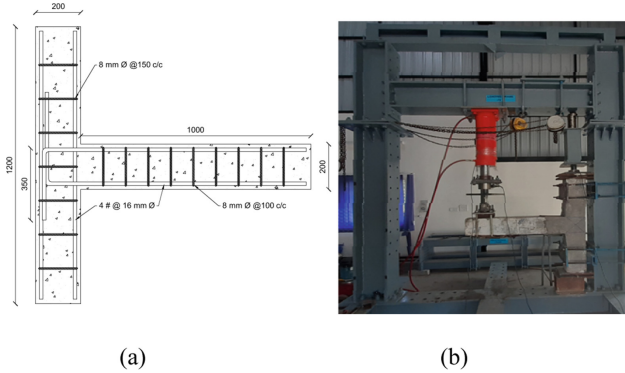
Typical reinforcement details of joint specimen and test setup.
